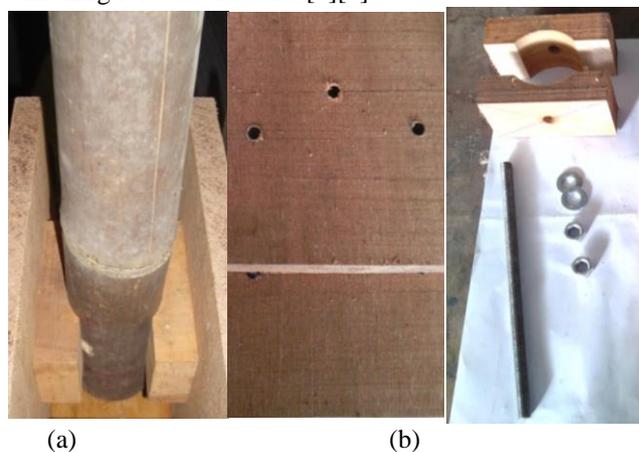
The Development connection system (a) Connection system using wooden plate and wooden clamp (b) connection system components
